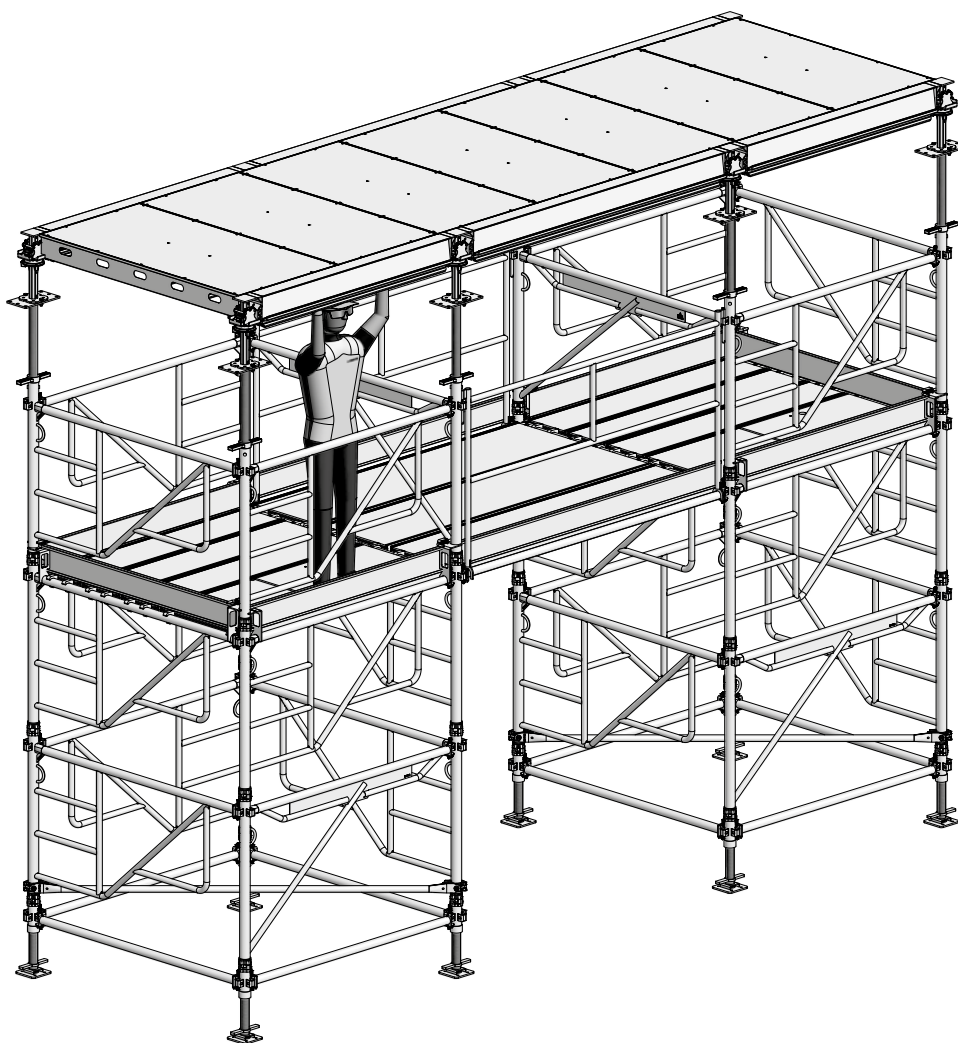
Use as a tower to support the MevaDec slab formwork
